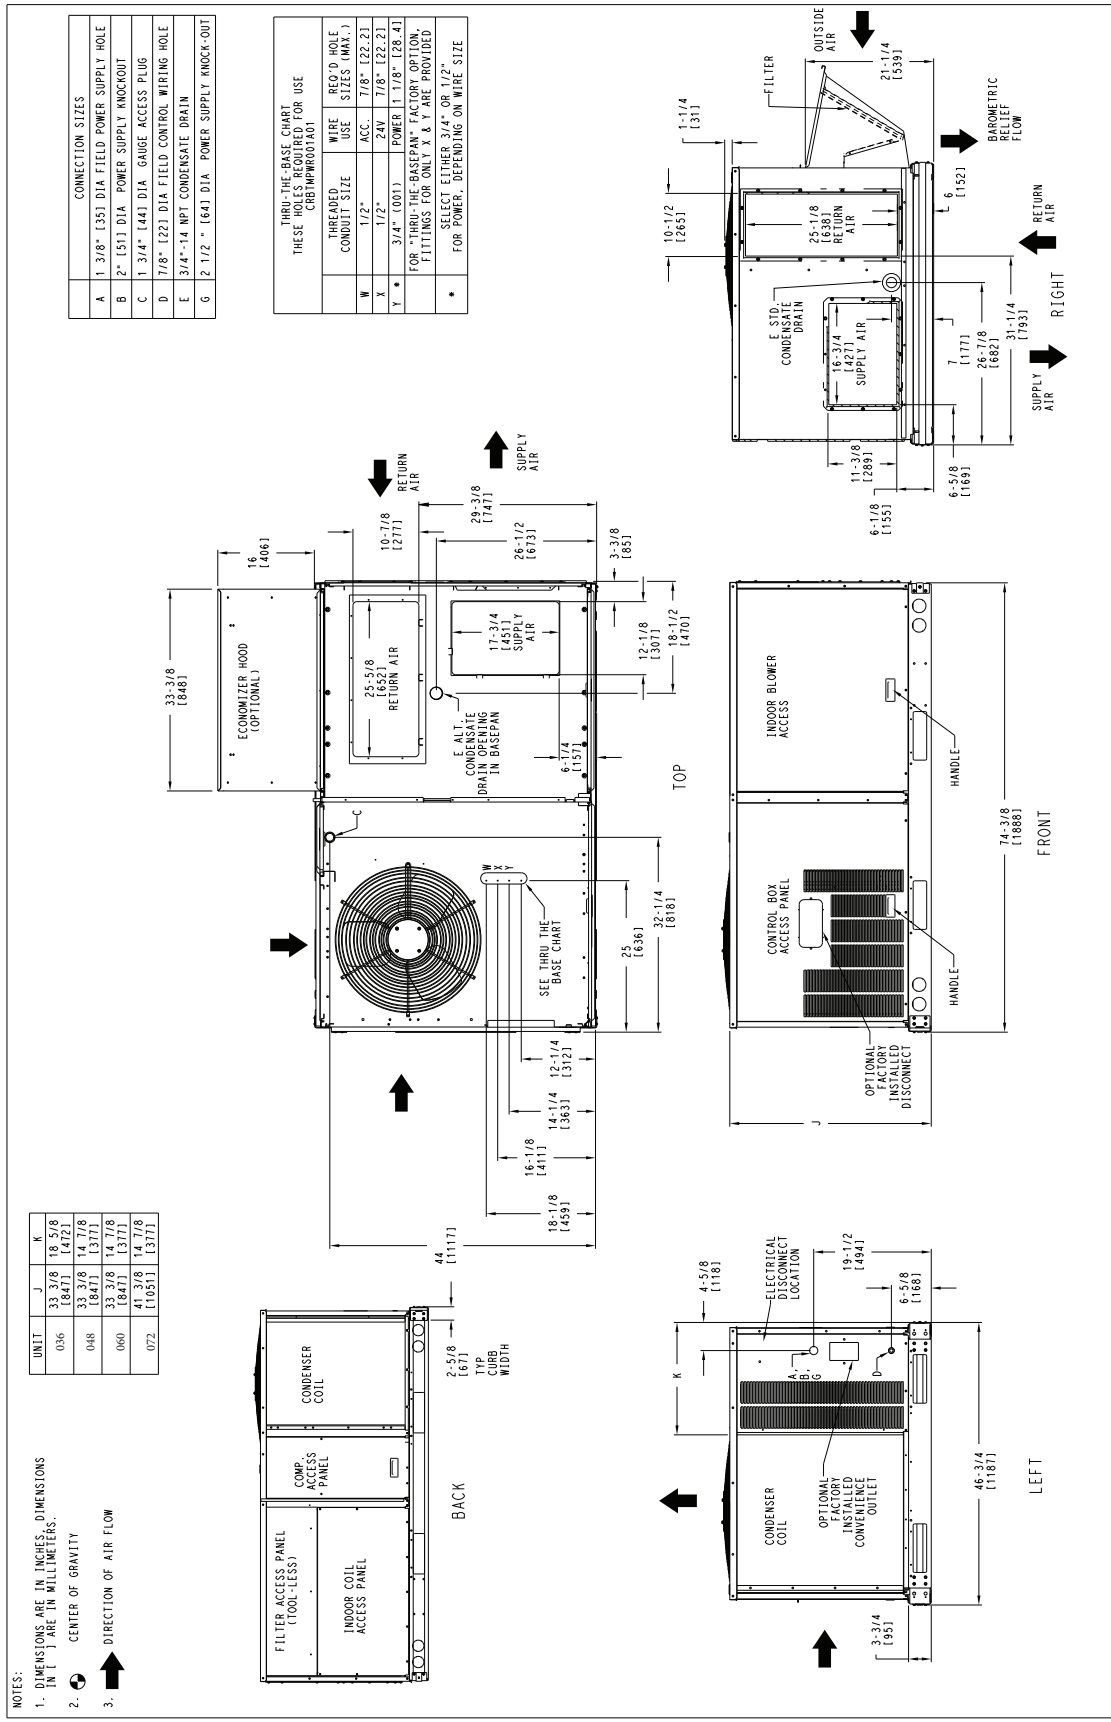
Dimensions RAS 036-072 (Sheet 1 of 2)
